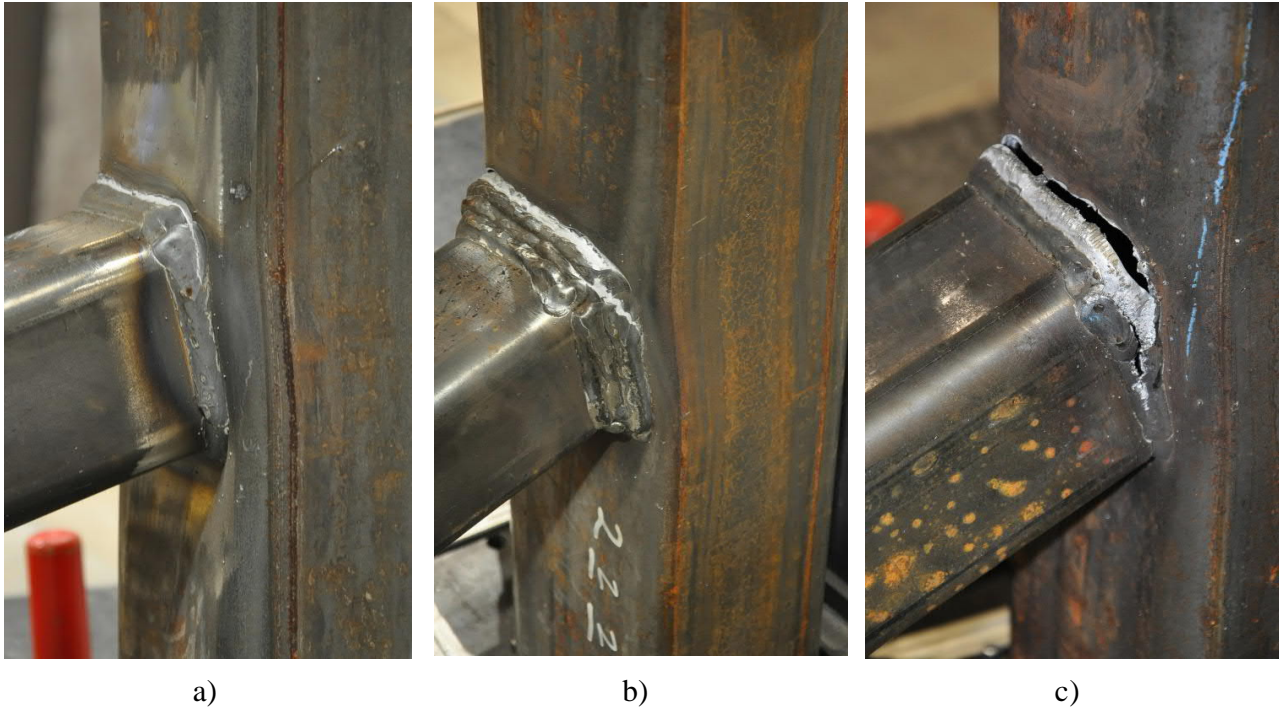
Observed failure modes: a) chord face failure; b) chord side walls failure; c) punching shear.
